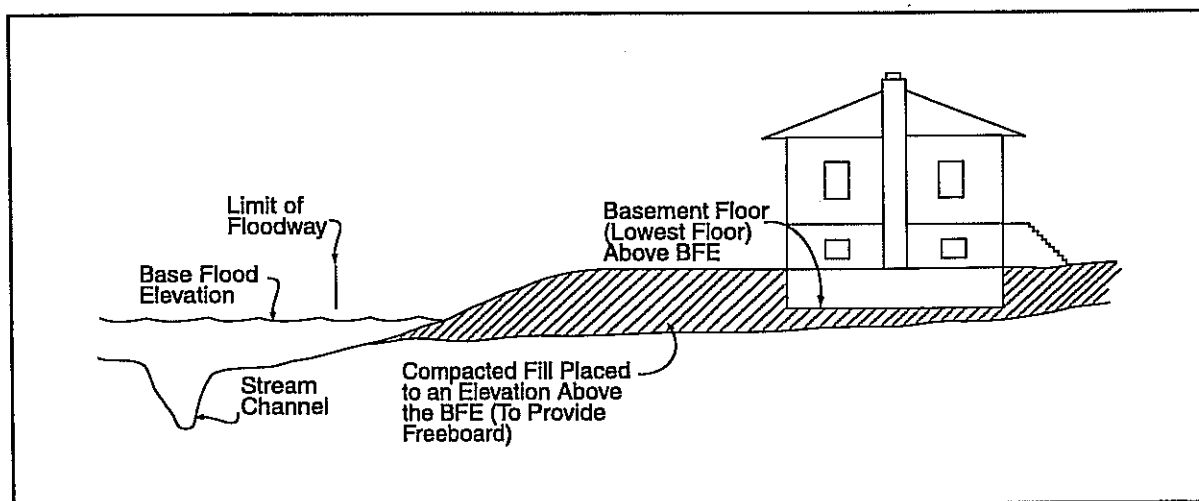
Basement foundation with lowest floor above the BFE. Damage from floods below the BFE is eliminated.
